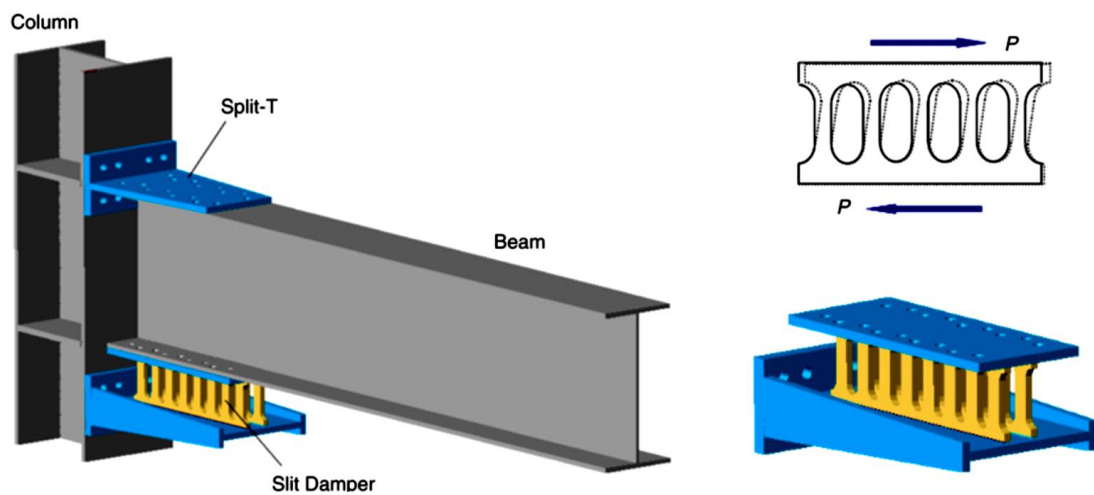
Slit damper in beam-to-column connection (Oh et al. 2009)
